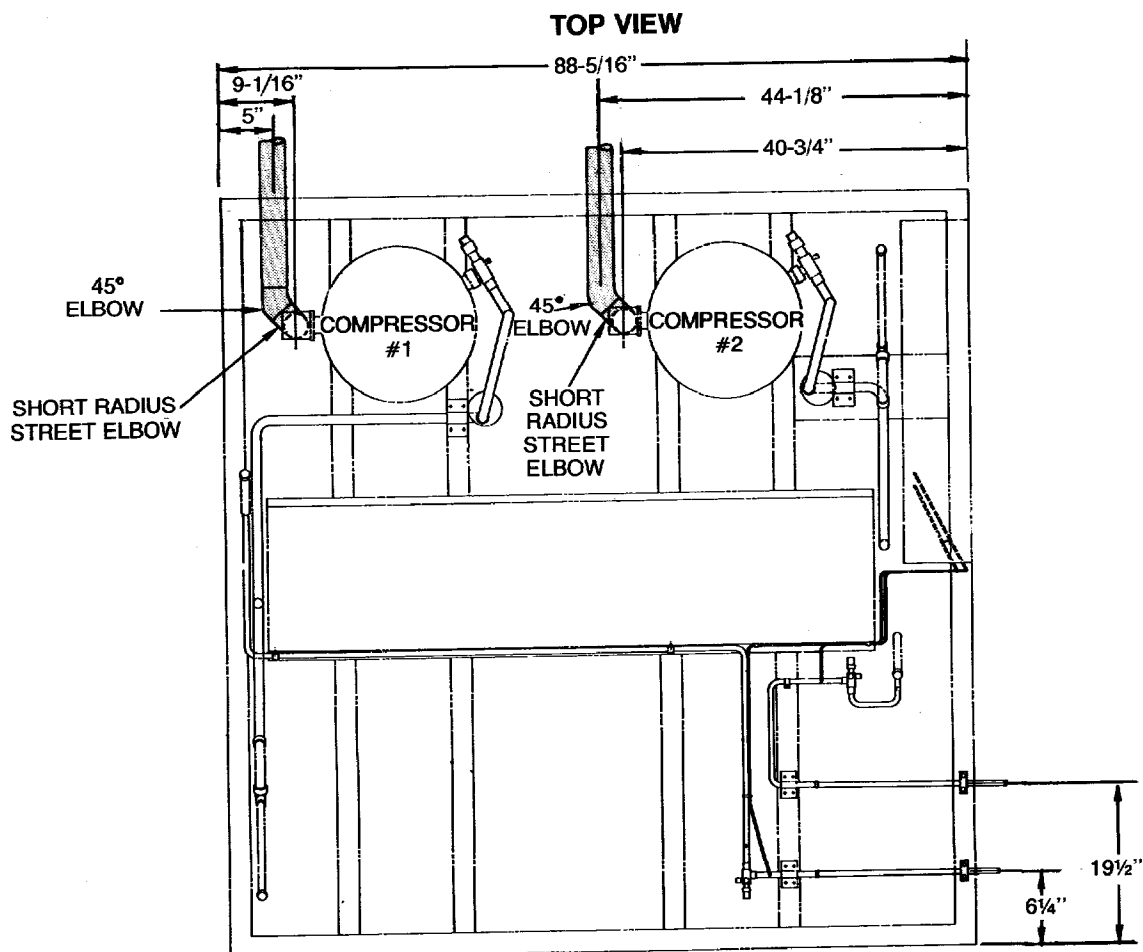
Piping Installation: 40-Ton Units Without Isolators
